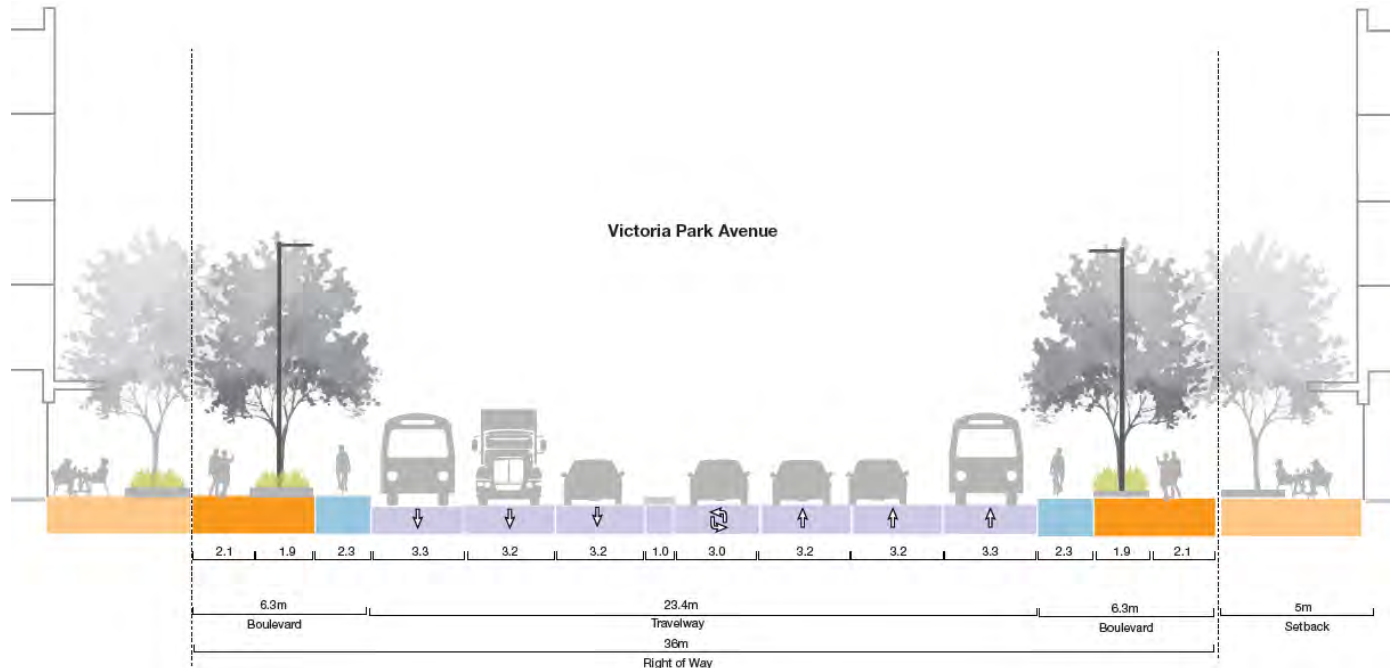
Victoria Park Avenue Preferred Cross-Section
